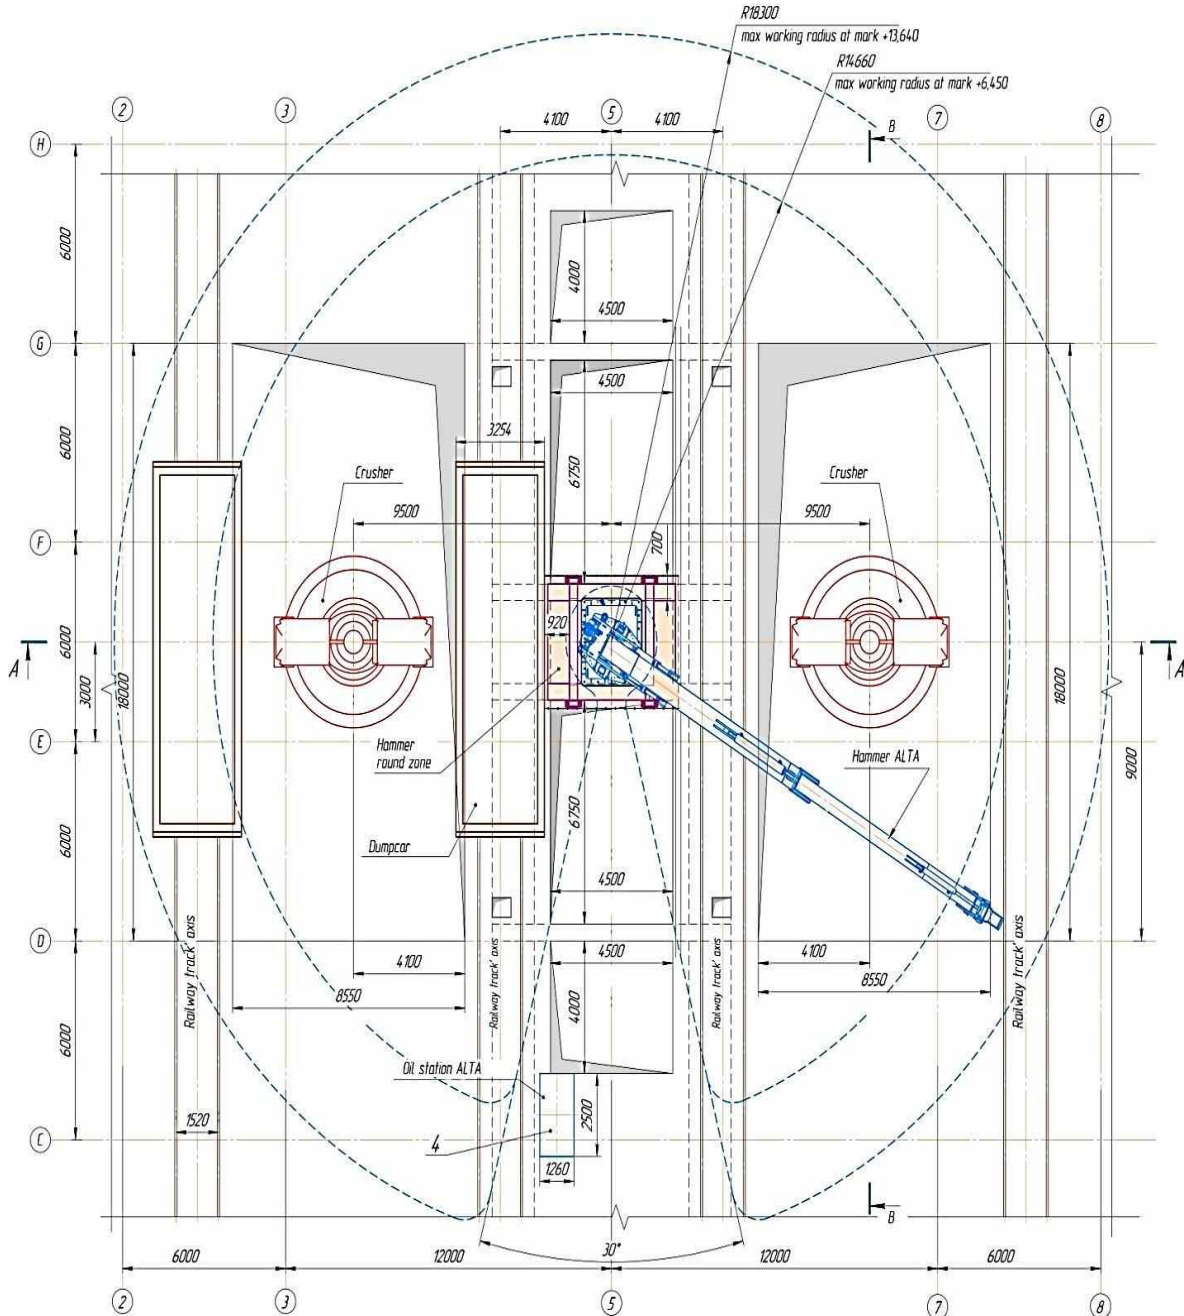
The plan for the installation of the hammer GR-158 at the mark +13,640
